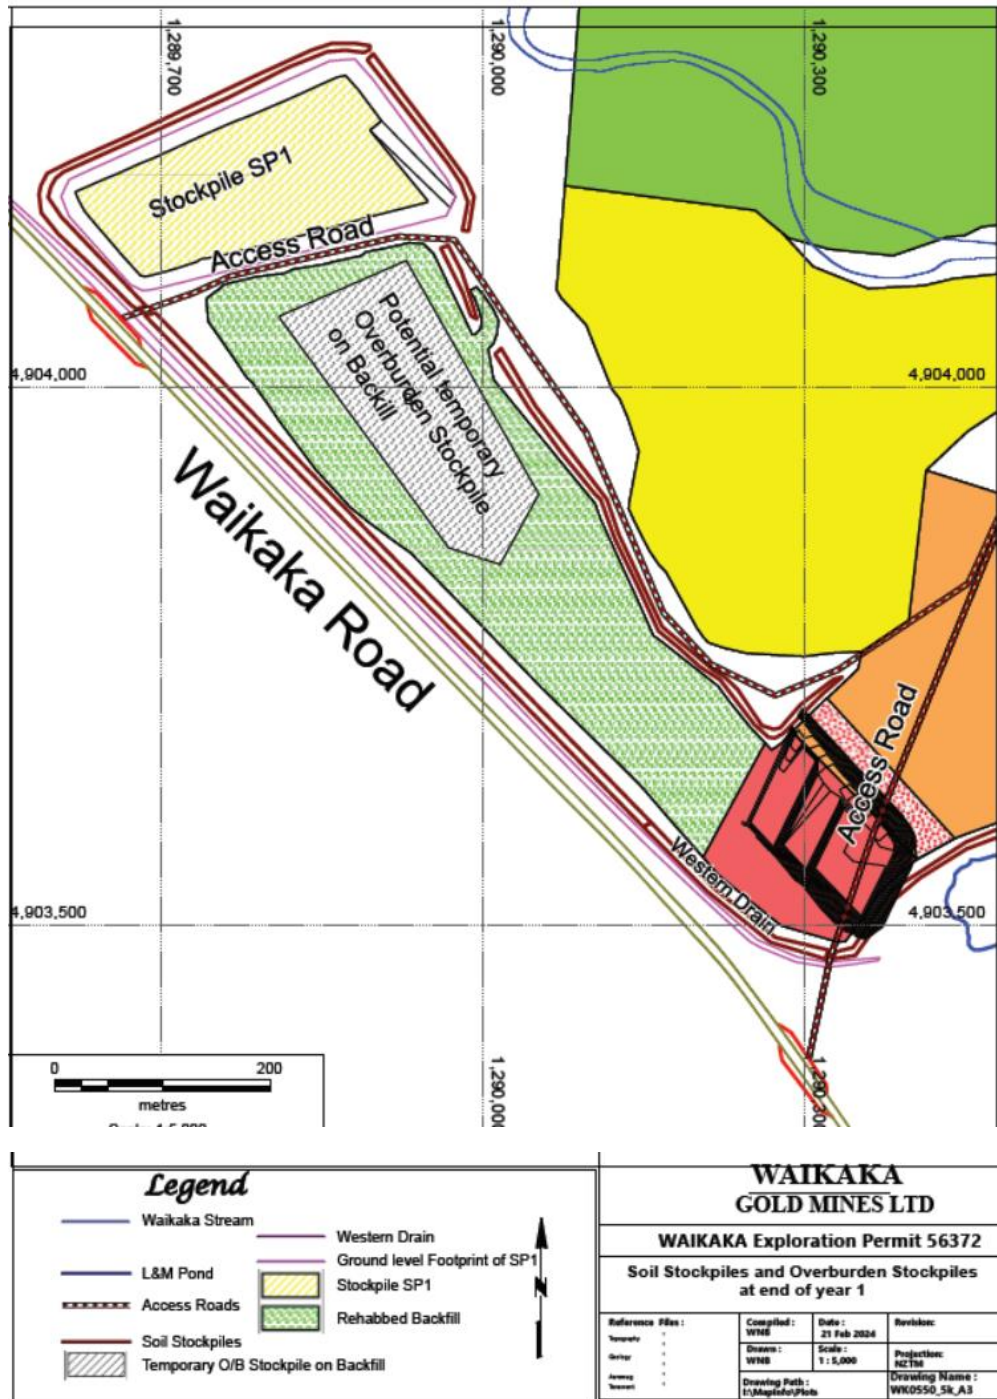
Plan showing the position of topsoil stockpiles and temporary overburden stockpiles.
